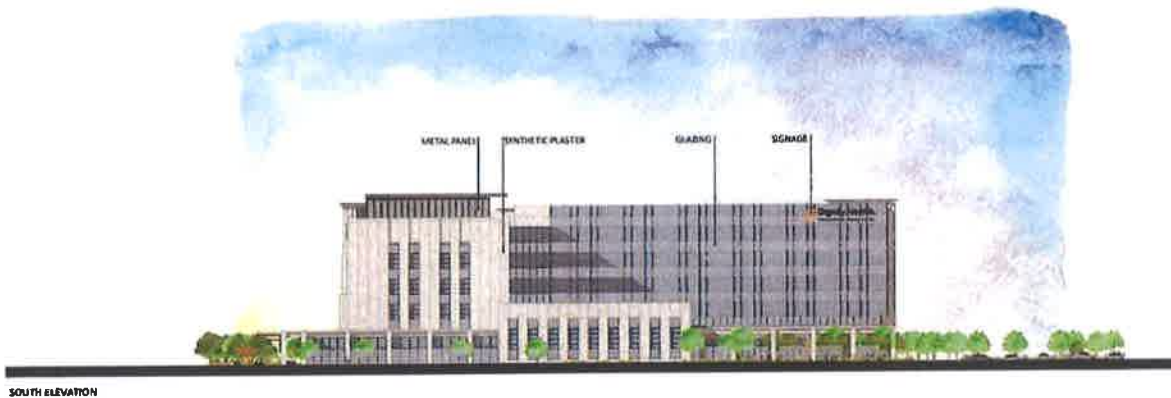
SOUTHERN ELEVATION OF HOSPITAL BUILDING
